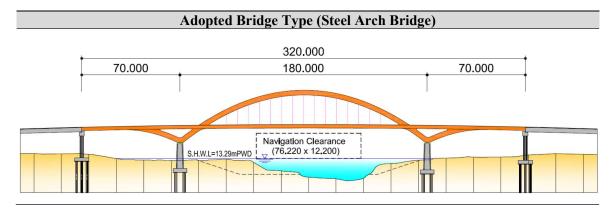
Adopted Bridge Type (Steel Arch Bridge)
